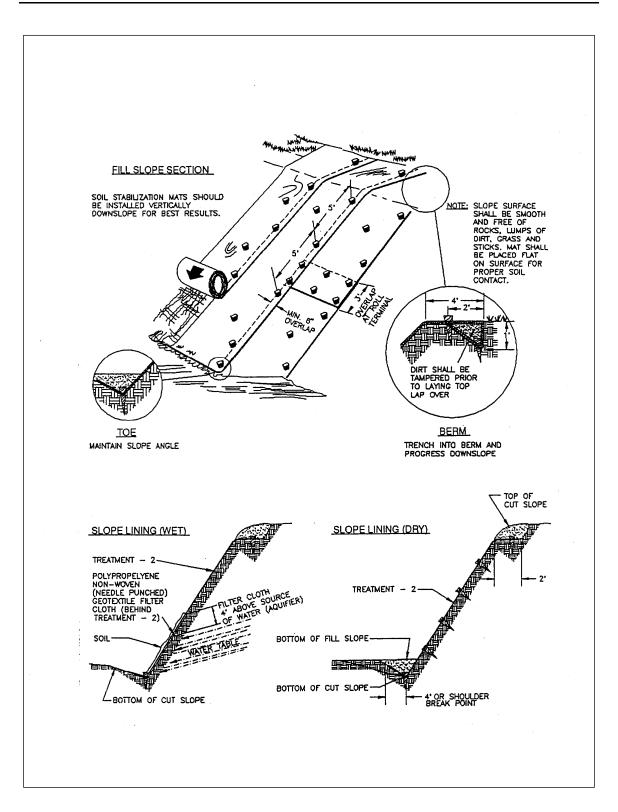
Typical Treatment 2 – Soil Stabilization Matting Slope Installation
